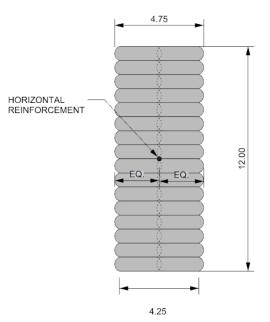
Double bead Section for Horizontal Span between Grouted Cores
